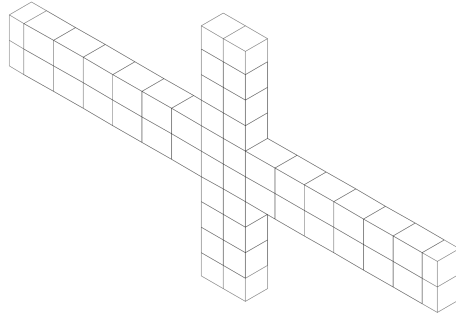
FE model adopted for the analysis of the beam-column joint element
